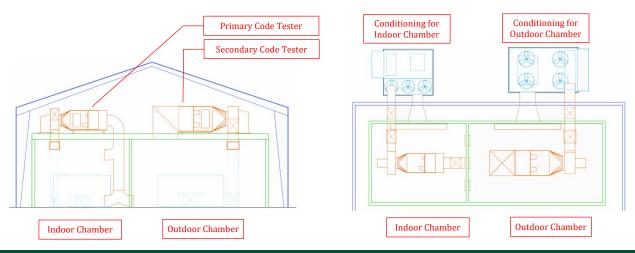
LABORATORY LAYOUT - SECTION VIEW
